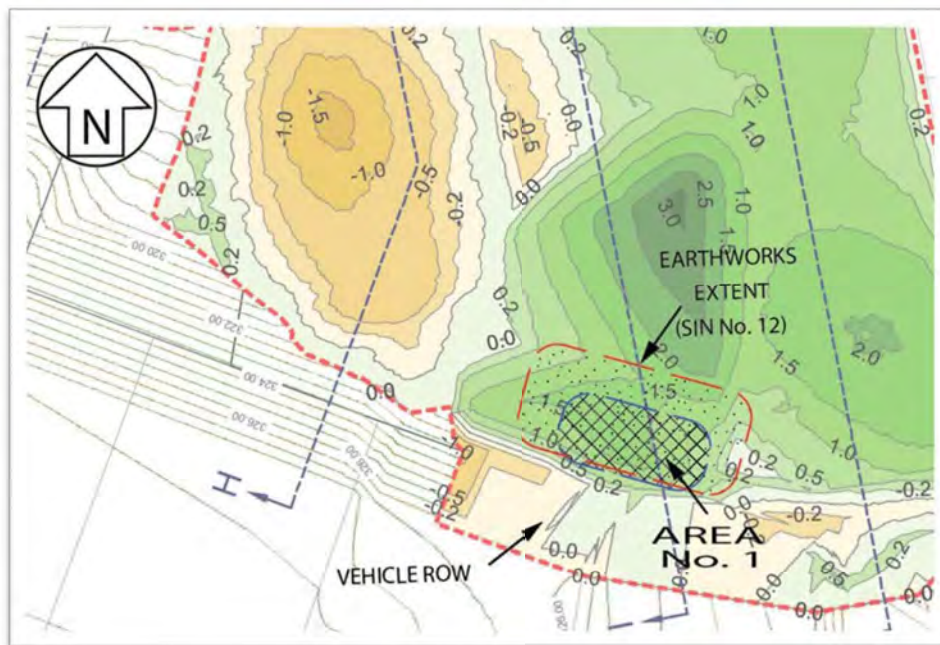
General location of engineered fill under construction relative to proposed earthworks plan
